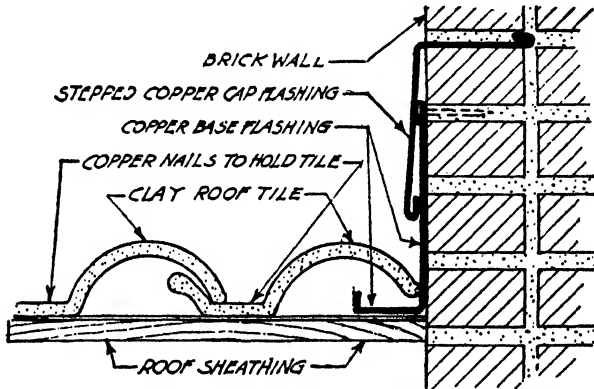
Flashing at the junction of a tile-covered sloping roof running down the side of a brick wall. Similar base and counter flashings are used where roof slopes away from wall.
